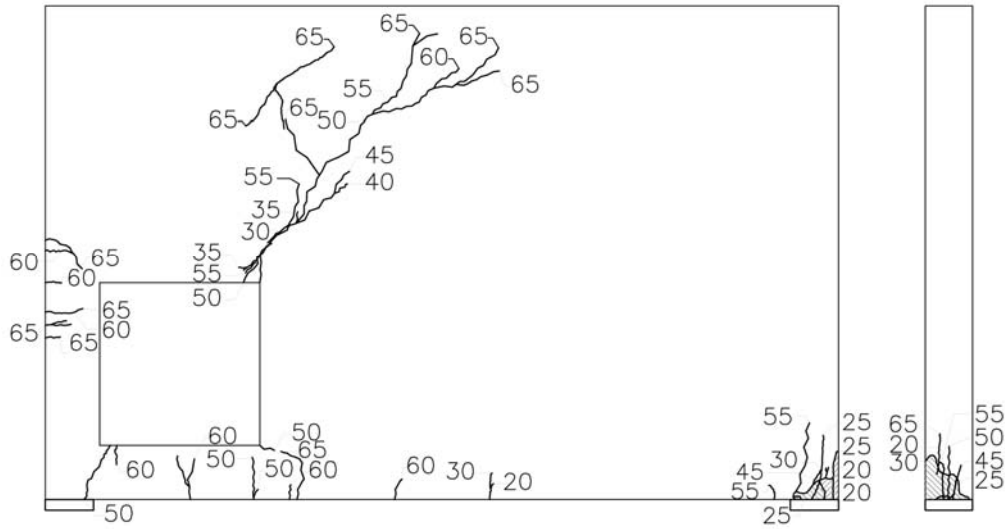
SFRC Cracks – Front face. Numbers indicate loading steps in kips (shaded area indicates spalling)
